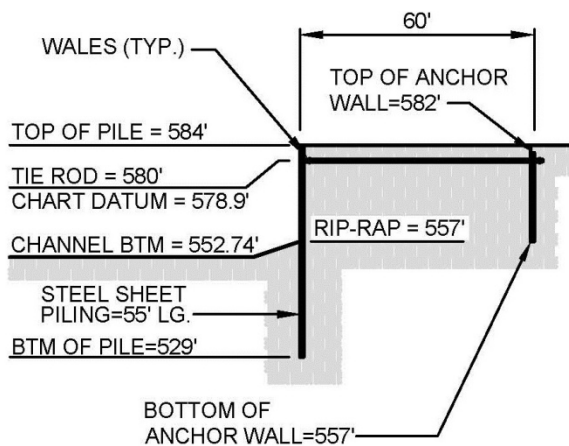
Typical Steel Sheet-Pile Wall Bulkhead.
